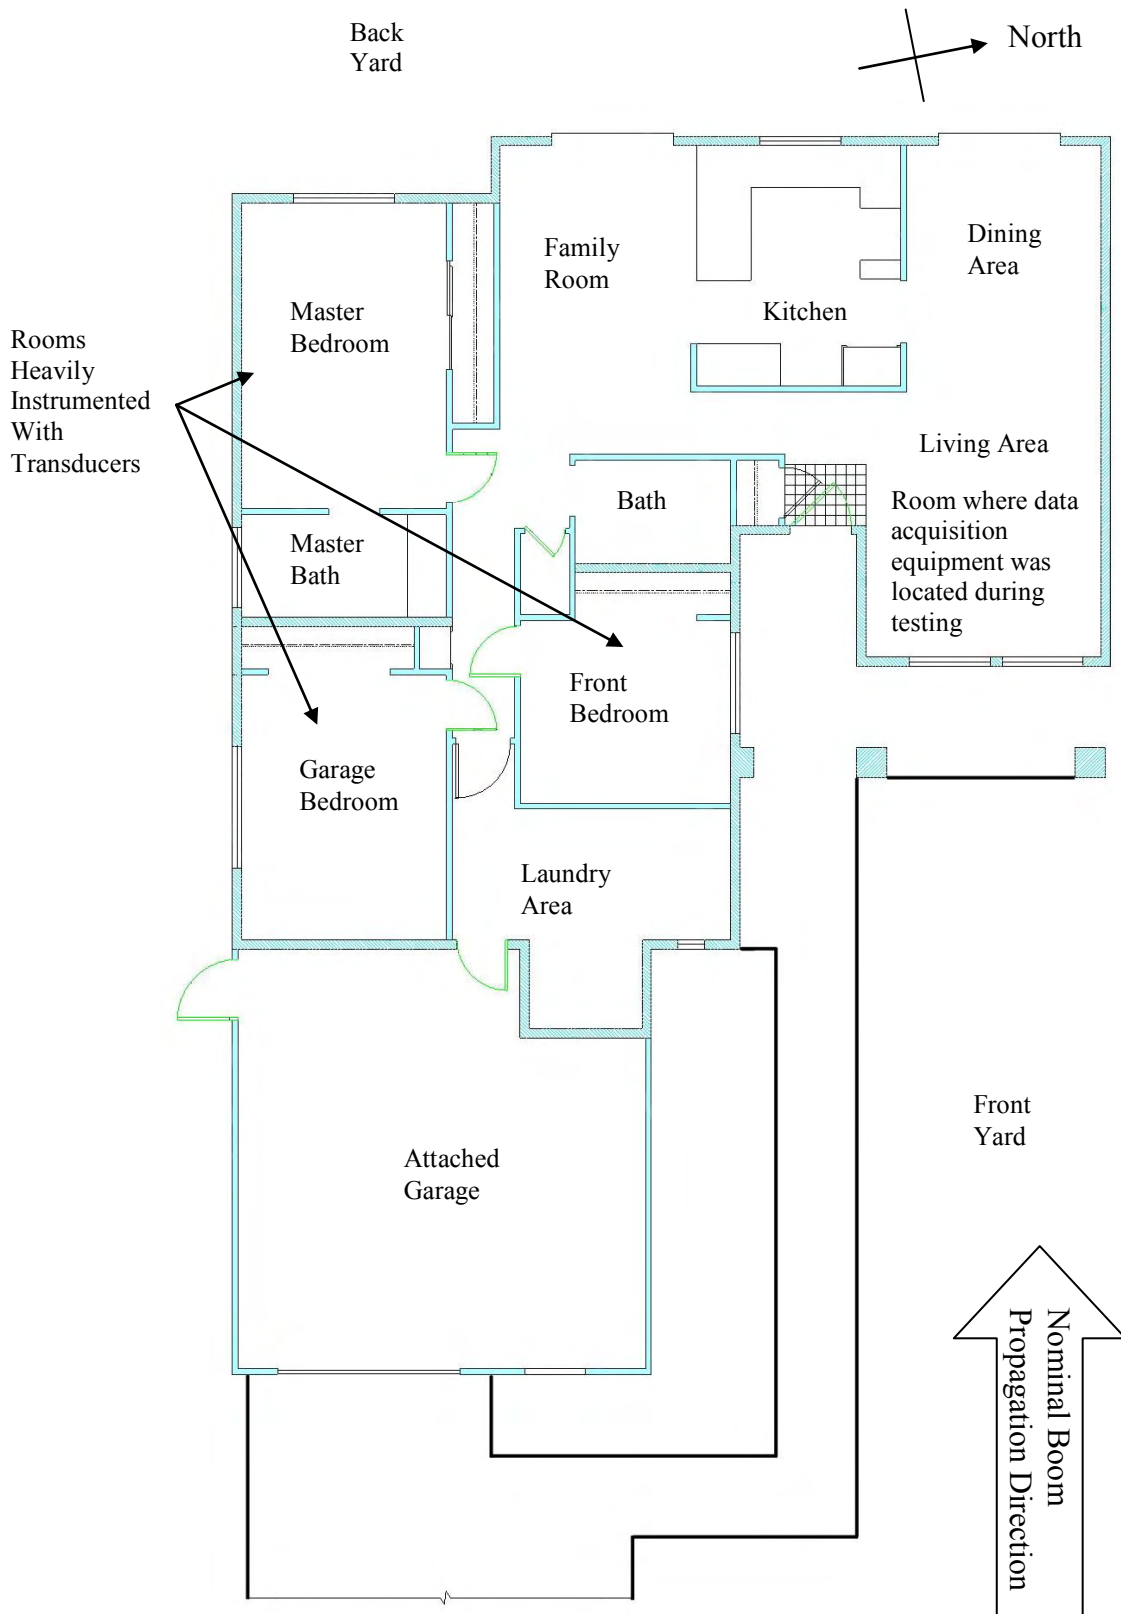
Floor plan of 52 Blackbird Street illustrating the bedrooms instrumented for structural acoustical measurements.
